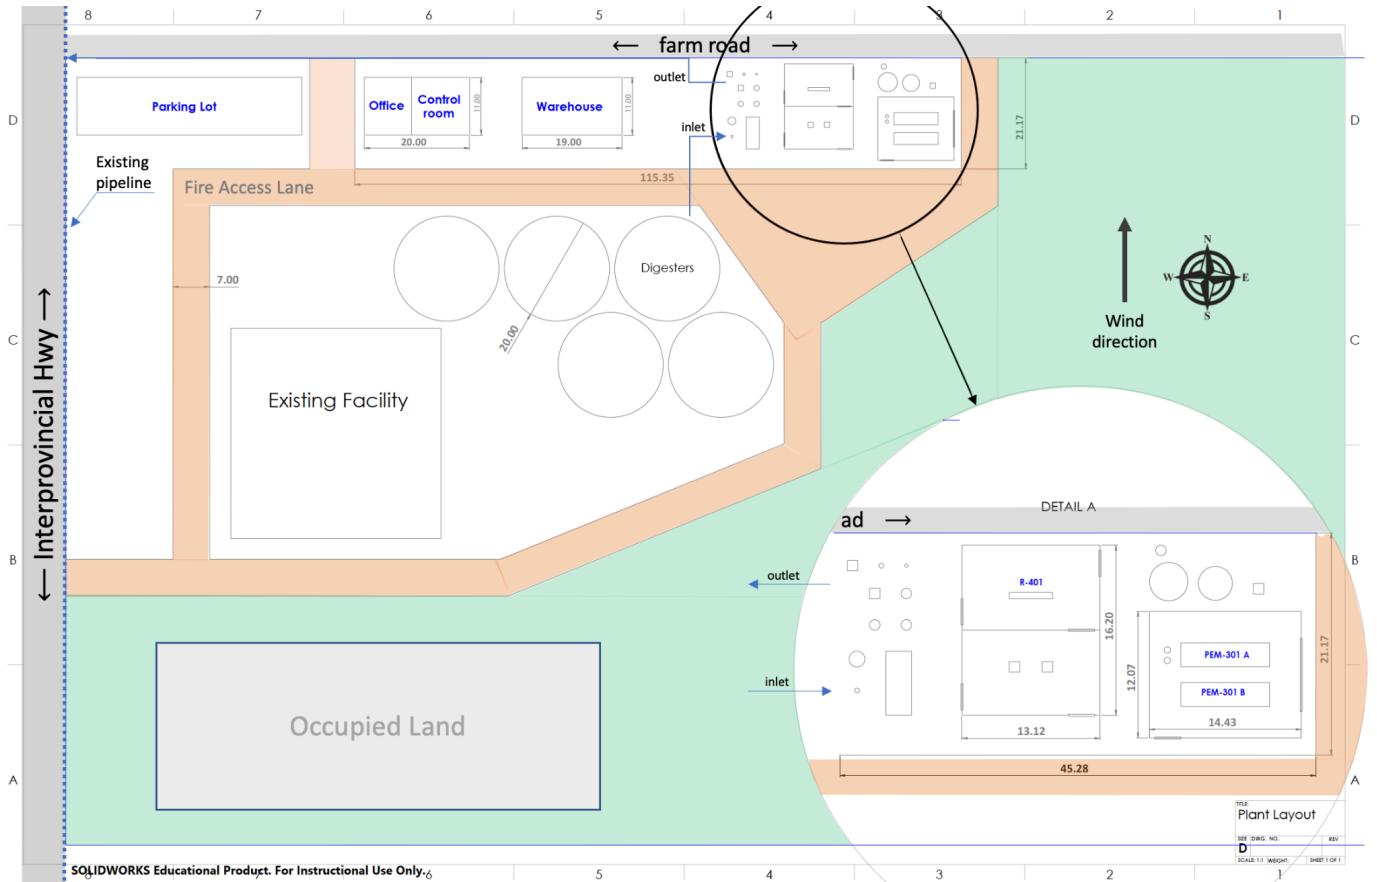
SOLIDWORKS 2-D drawing of the plant layout. DETAIL A shows the layout of the equipment. Unit of measurement is in meters.
